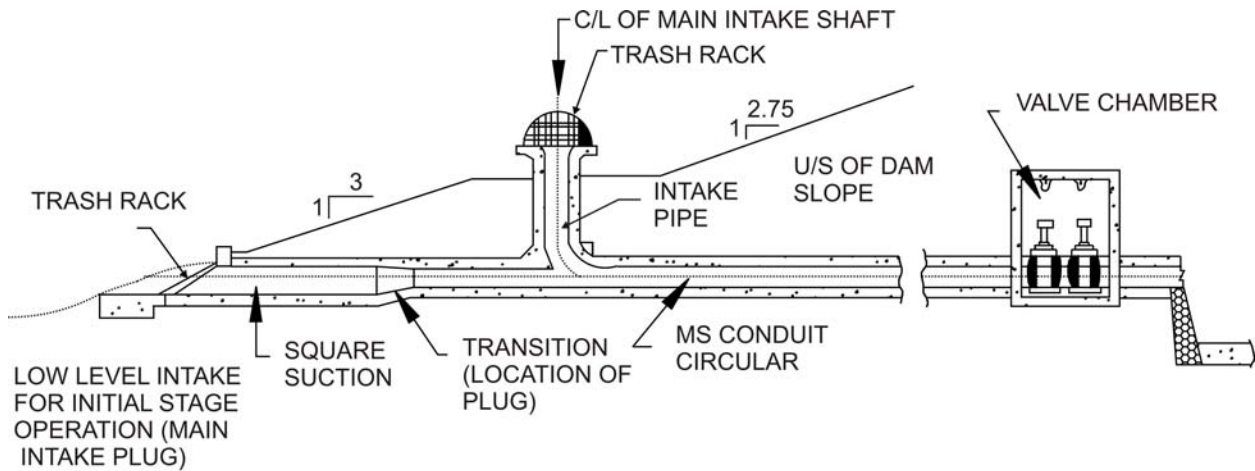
TYPICAL INSTALLATION IN AN EARTH DAM-SLOPING INTAKE
